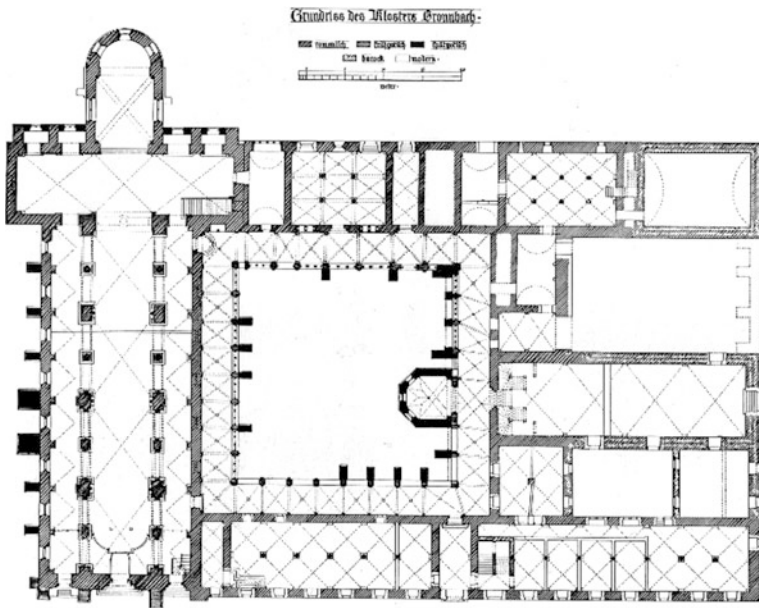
Parallel projection: floor plan of Bronnbach Monastery (Source © Wissmann (2009))
